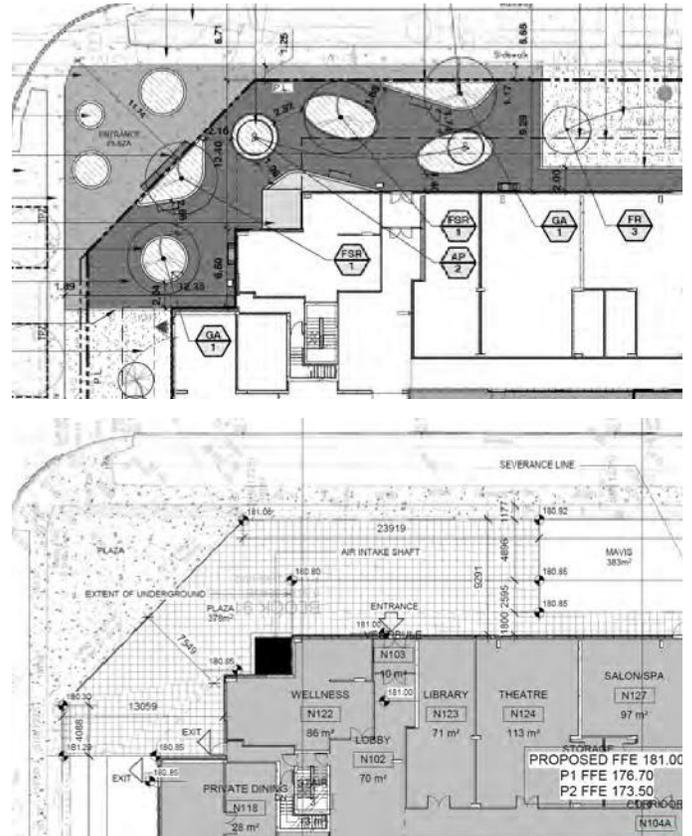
URBAN PLAZA LANDSCAPING (TOP) AND ARCHITECTURAL PLANS (BOTTOM).
